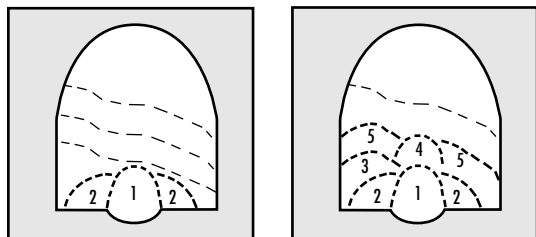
48. Hammer working sequence when rock layers are inclined.
